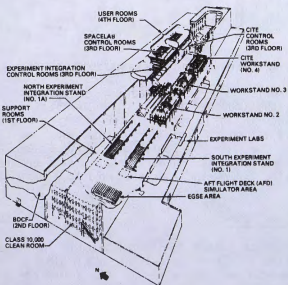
O & C BUILDING ASSEMBLY & TEST AREA
